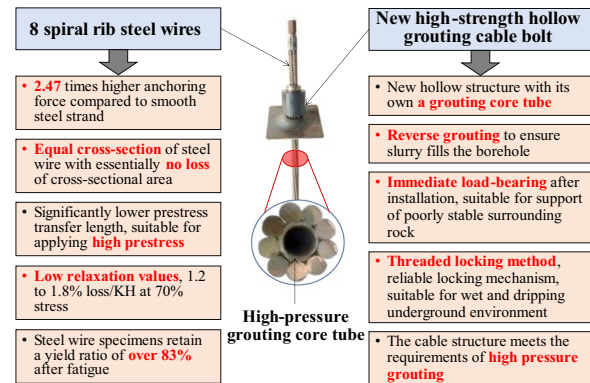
New hollow grouting cable bolt made of spiral rib steel wire
